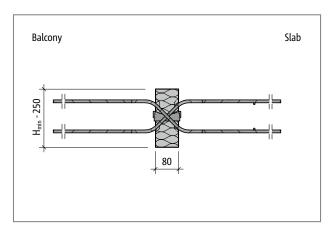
Schöck Isokorb® T type Q-E-VV7: Product layout
